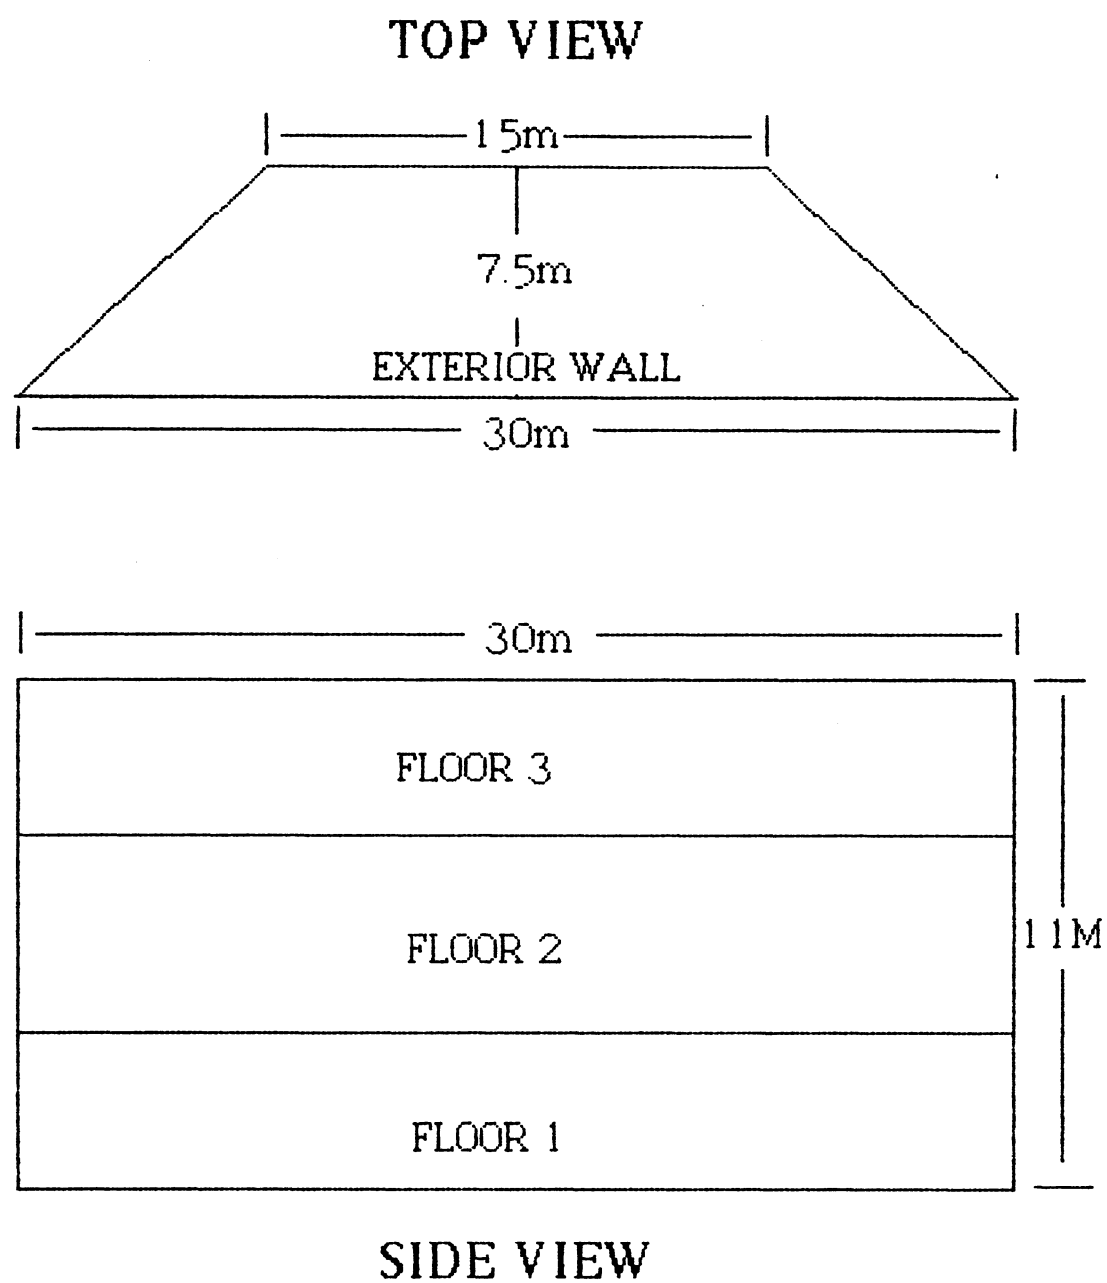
Views of the Base Case Building Used in Section 6.1.
